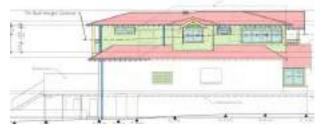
Section 8.2 development showing the amended side eastern elevation.
